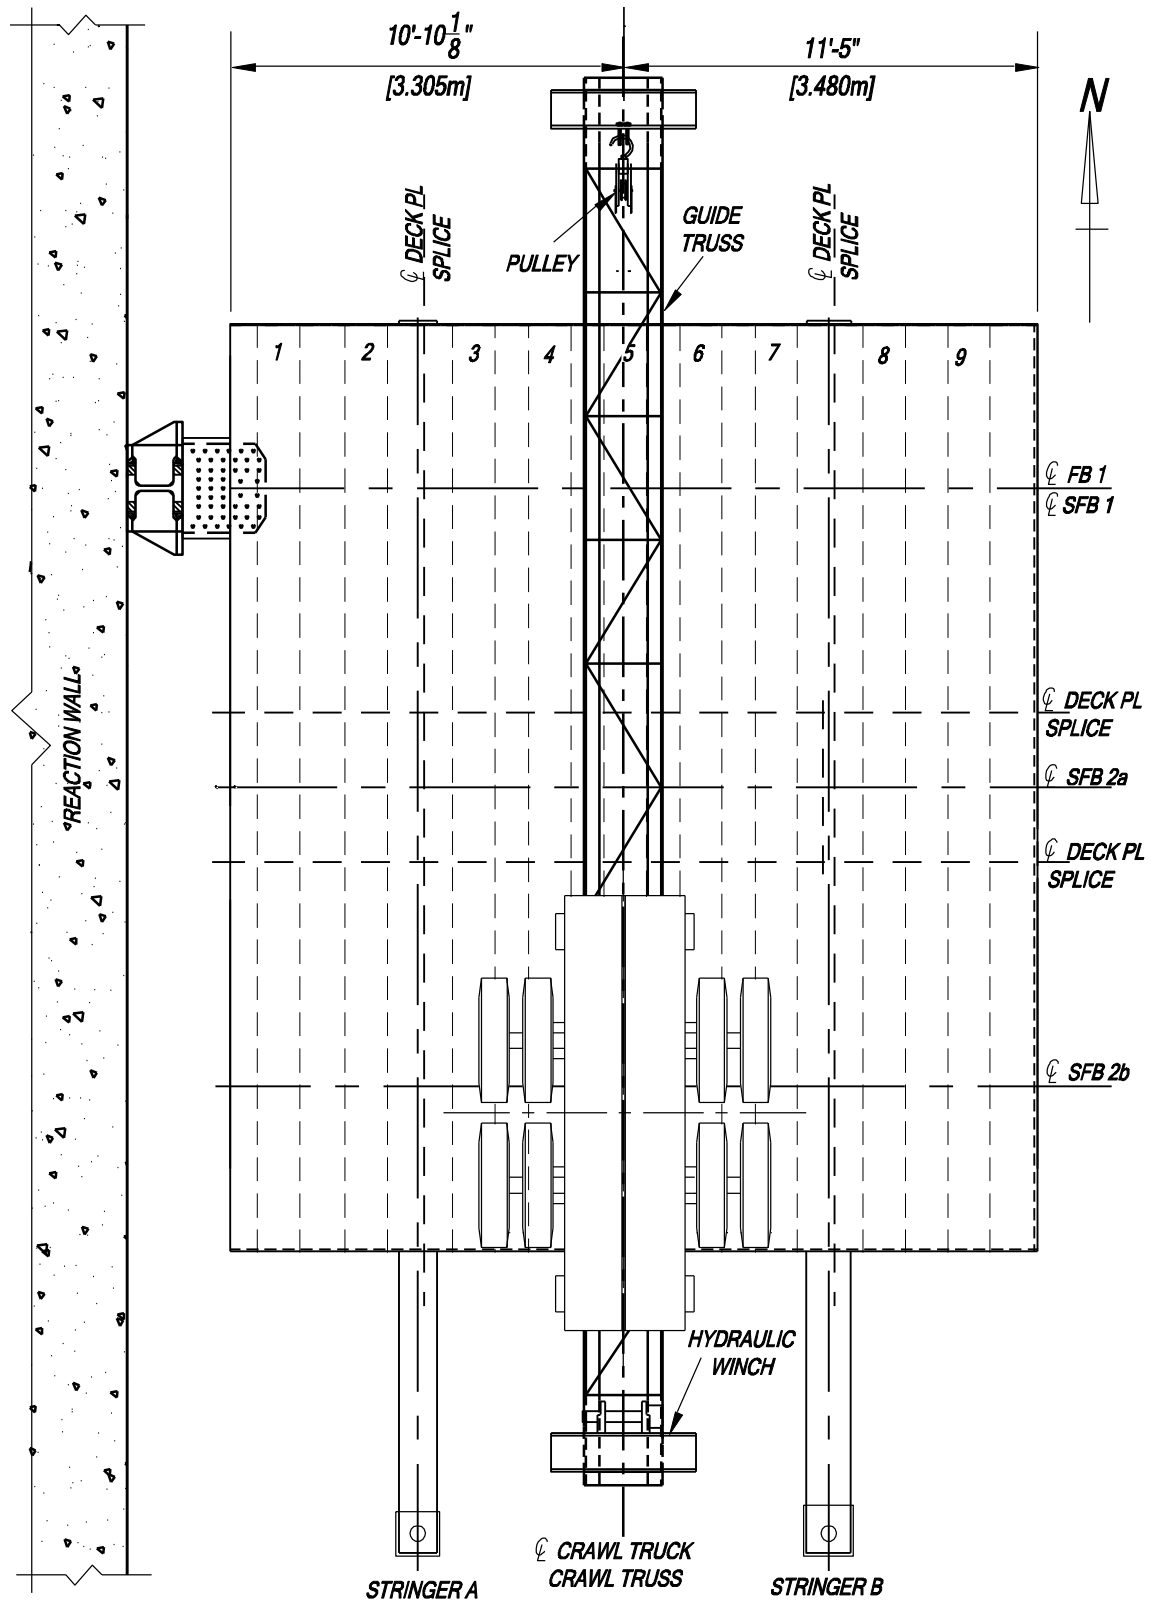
Crawl Test arrangement with guide truss and crawl truck in position
